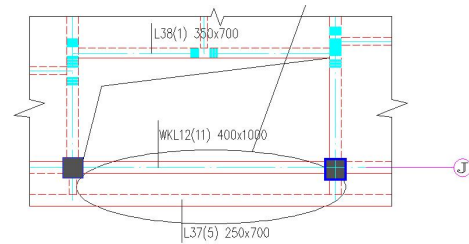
Structural Layout of Roof Podium +32.250m Structural Plane J × 30 Axis Area
